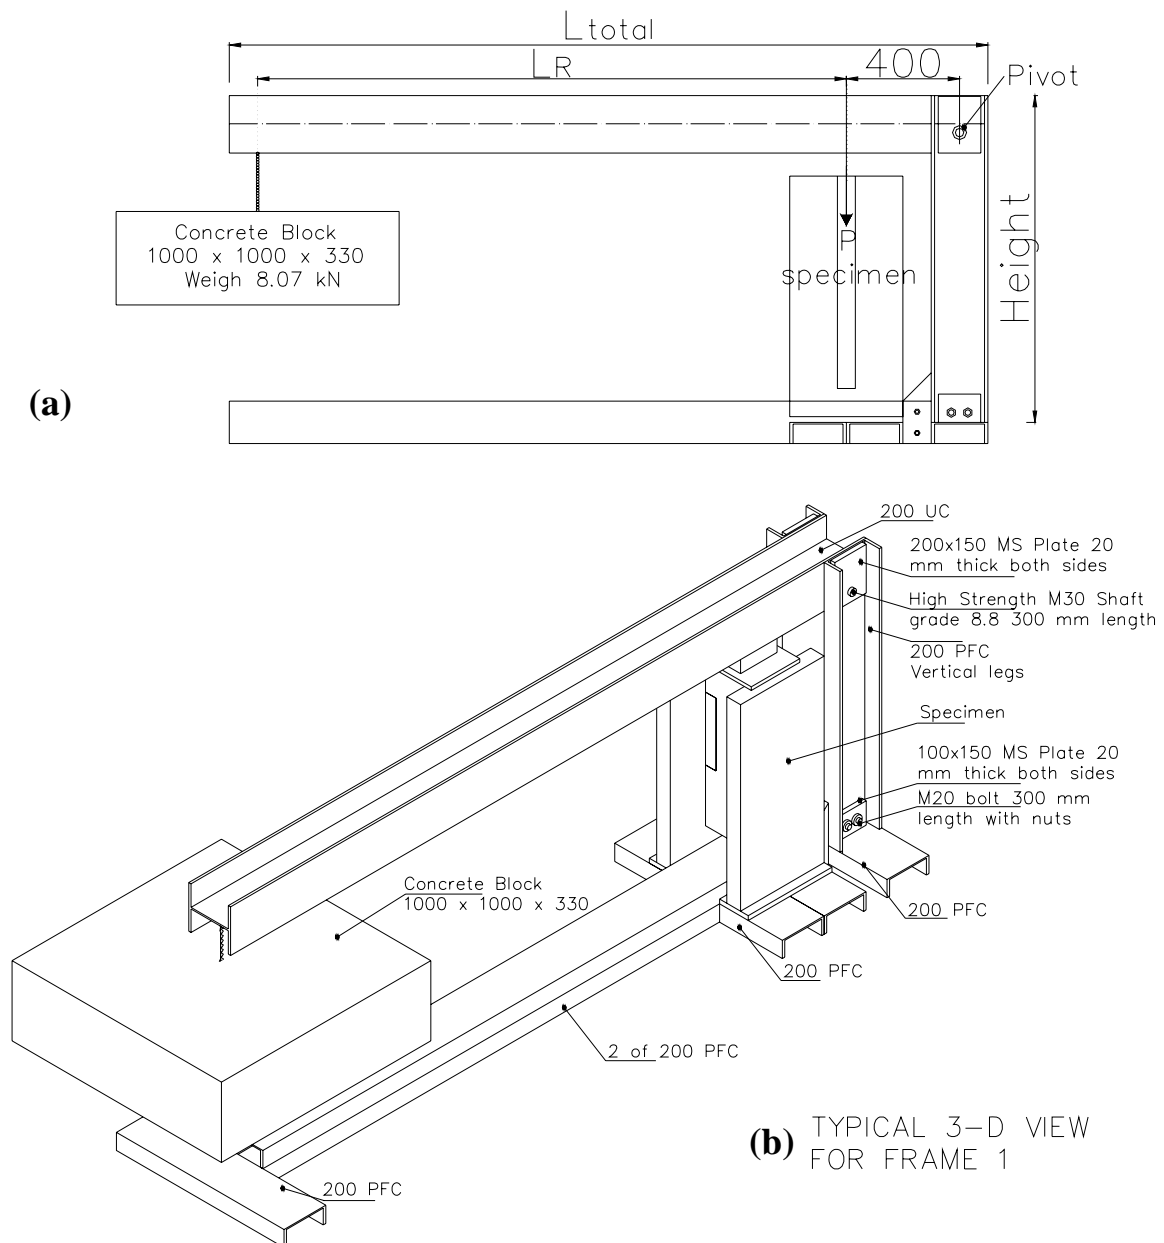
Typical set up of a long-term push-out test frame (a) Side elevation; and (b) 3-dimensional view of frame
